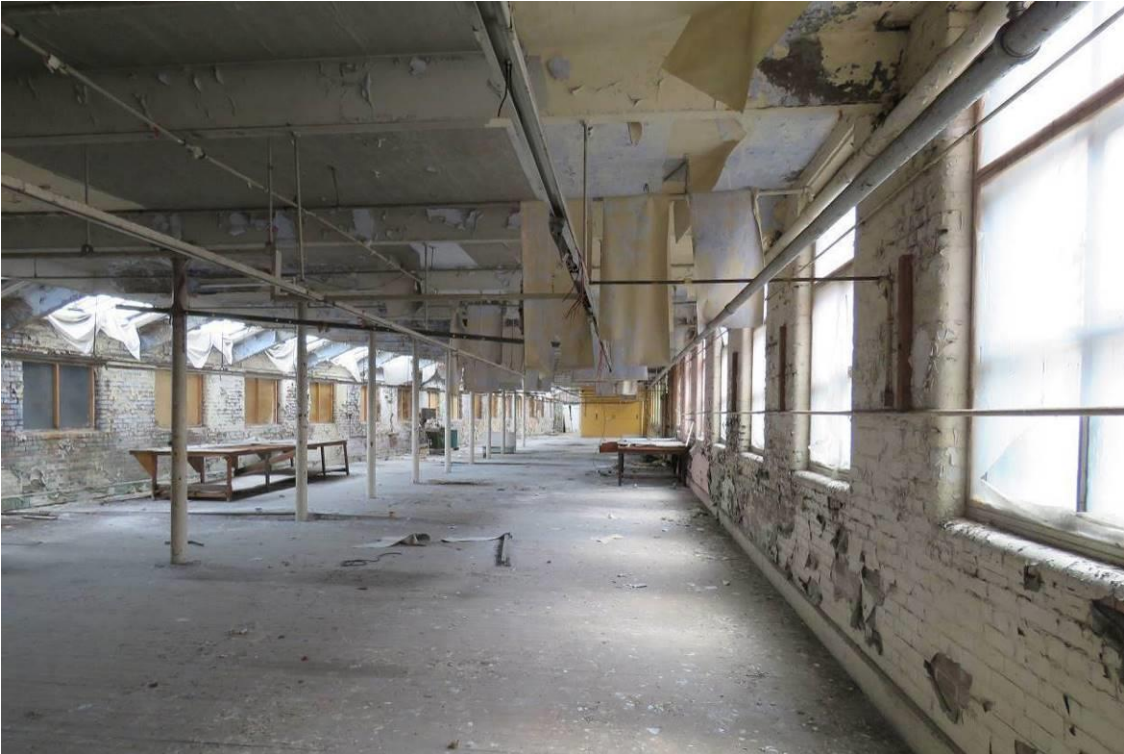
A view looking east across the inserted 1920s third floor level of the entrance block, showing the long roof light to the left.
